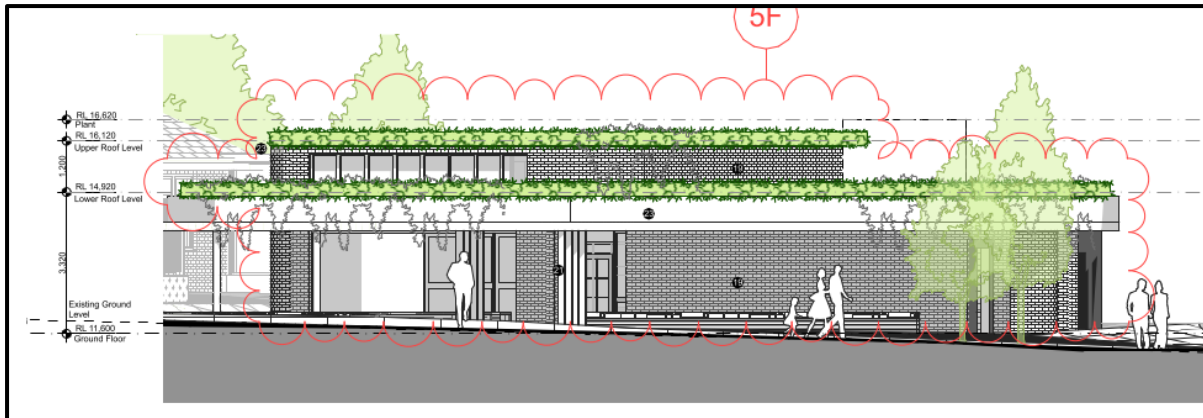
Proposed B7/8 West Elevation for Subject Modification C
